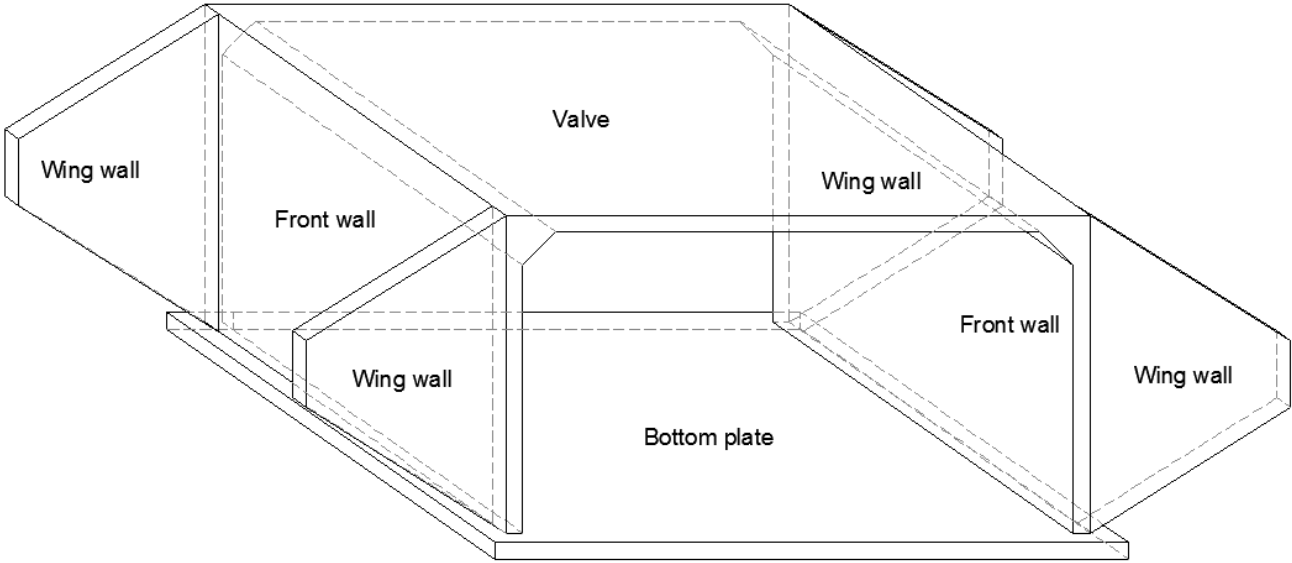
Schematic picture of a slab frame bridge with wing walls on a closed bottom plate.
